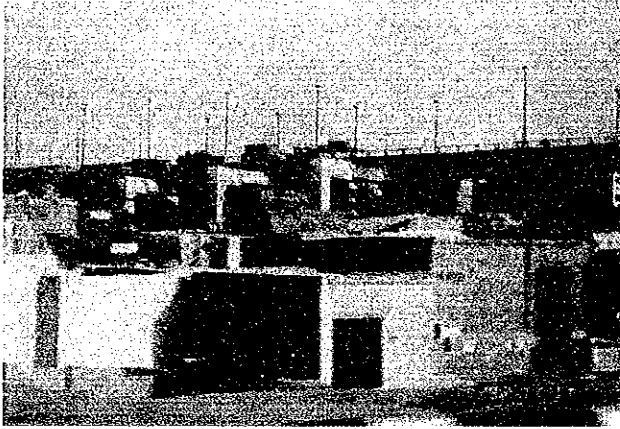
Elevated bridge in Cairo (rigid frame reinforced concrete piers. Cross beams of cantilever construction is not earthquake resistant.)
